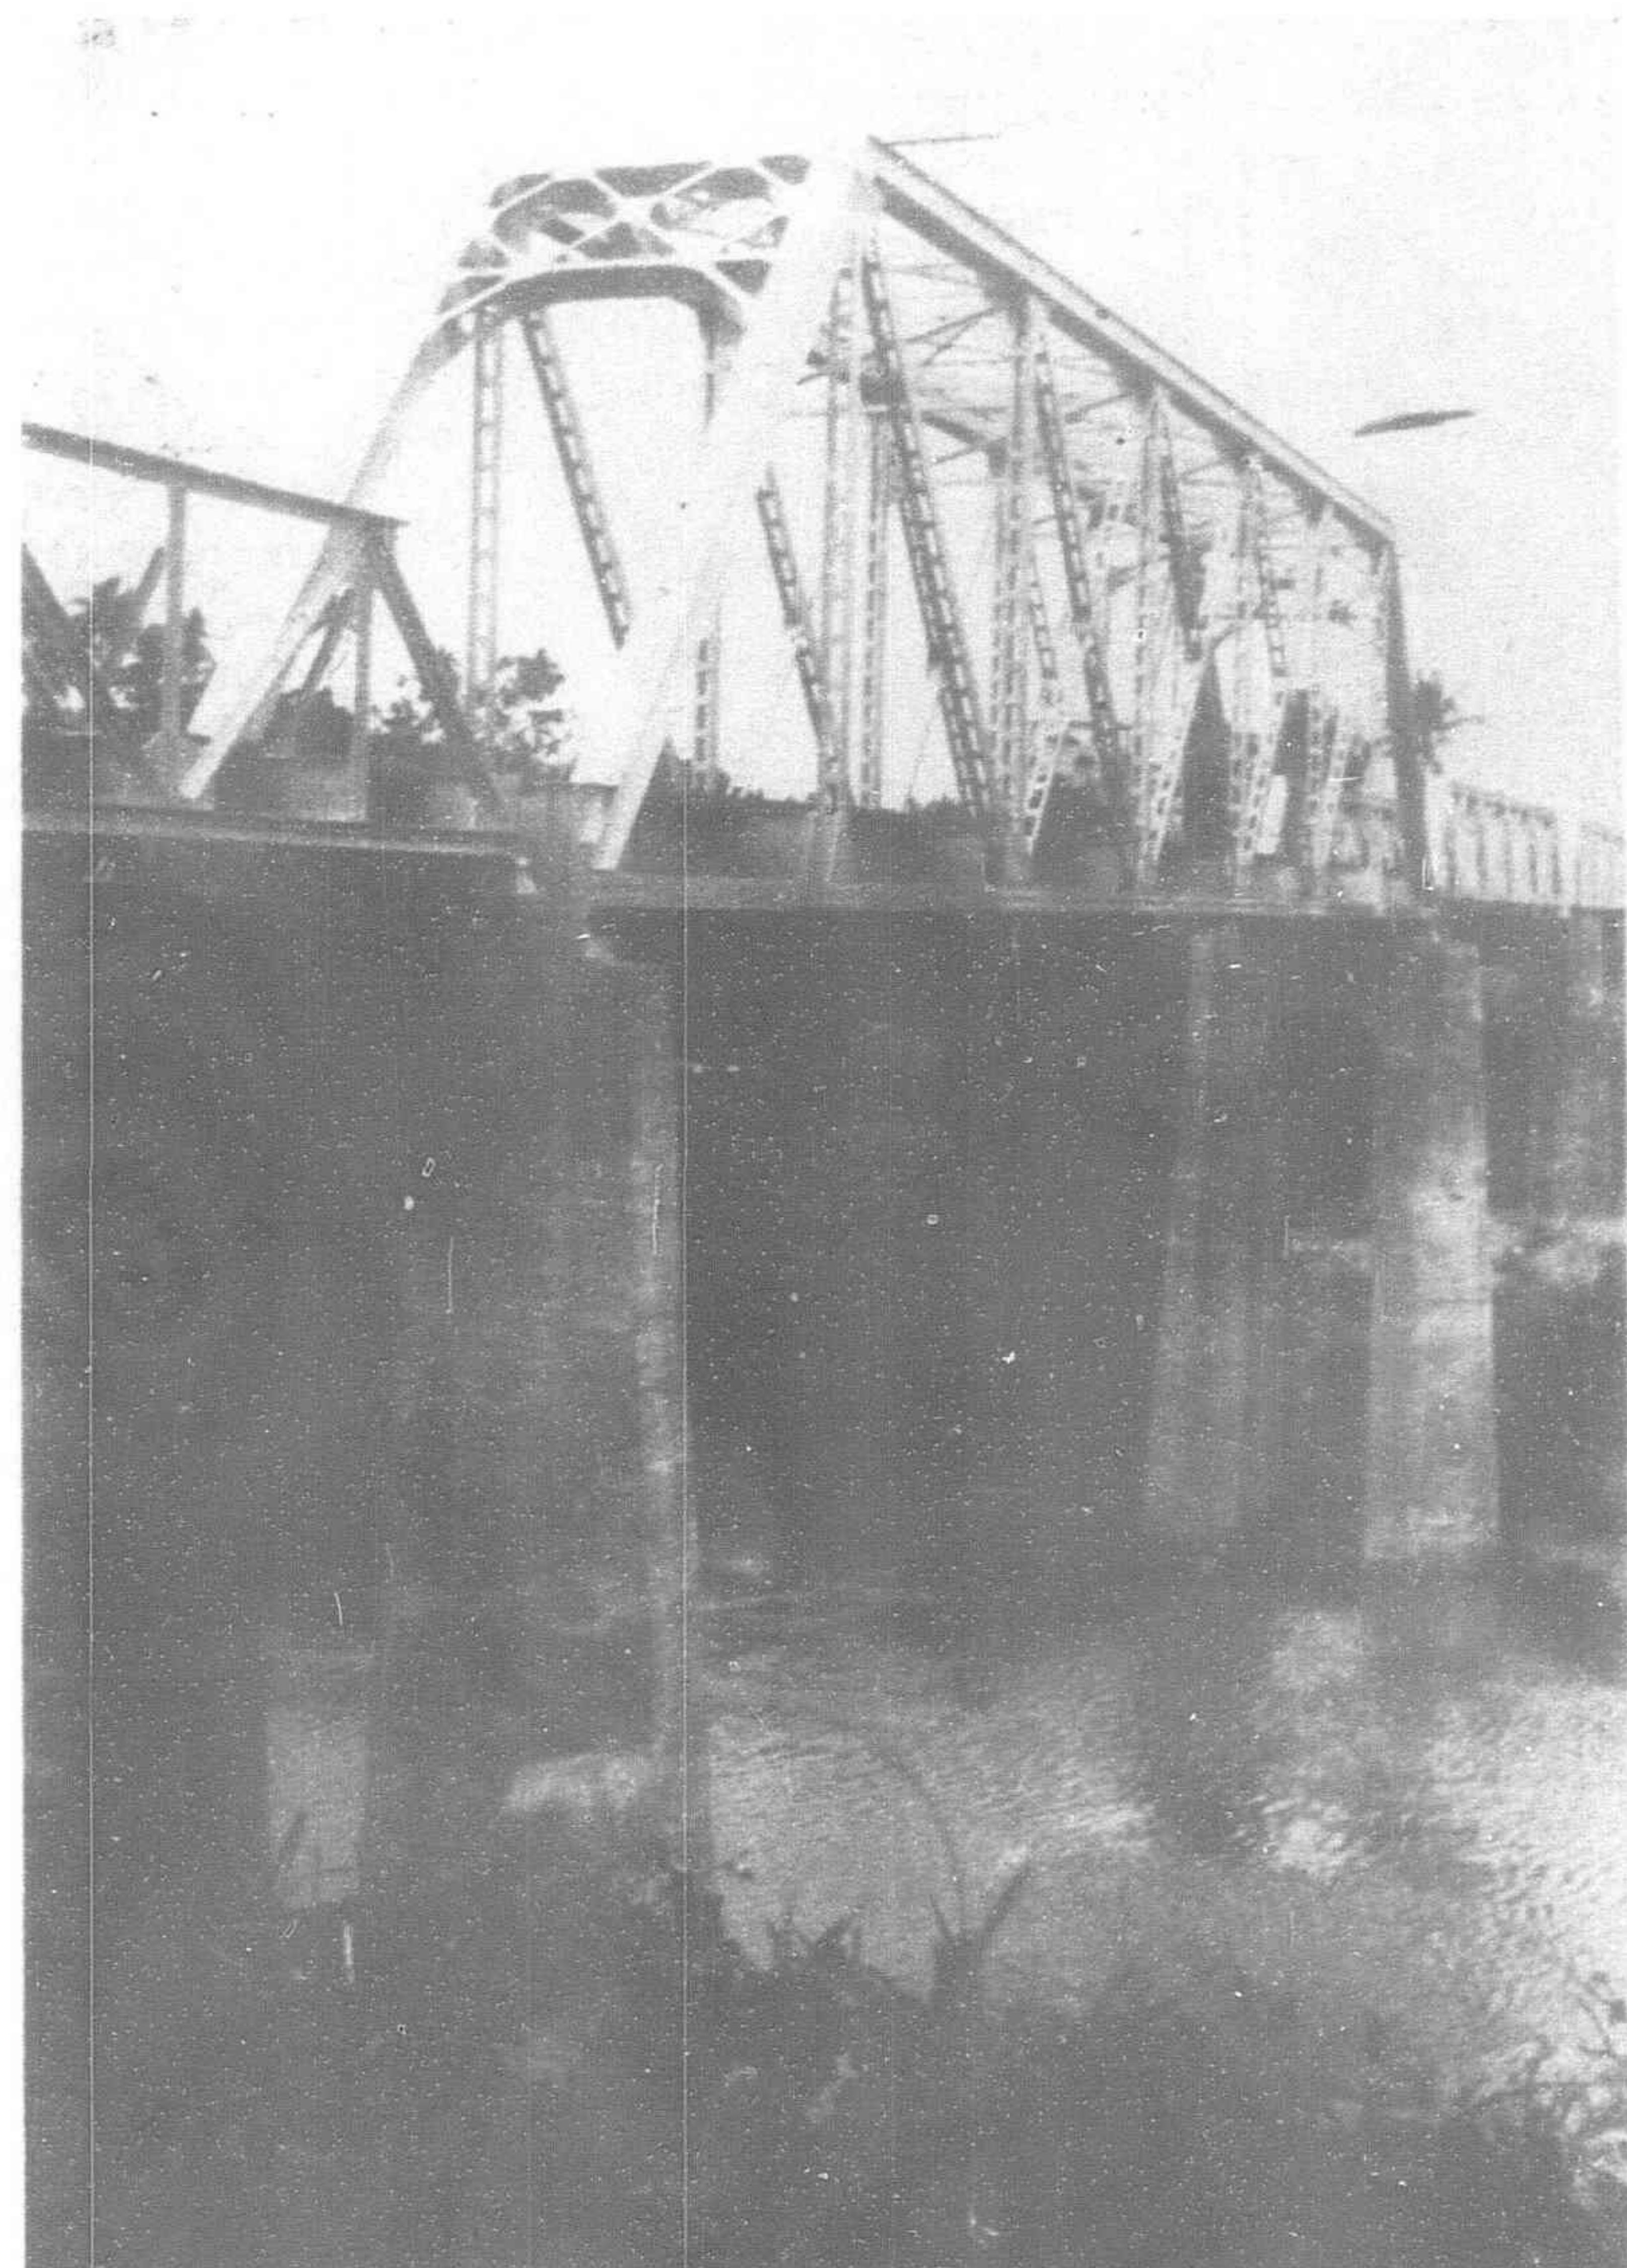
Manangle Bridge showing the 3-Arch Piers
